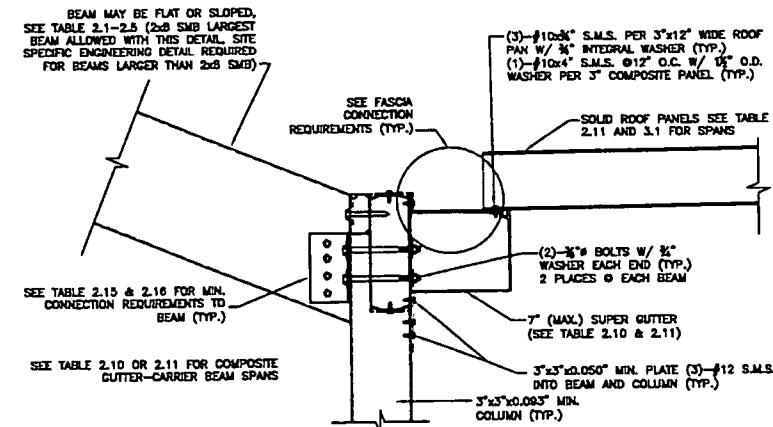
GABLE ROOF TRANSOM (RISER) WALL
